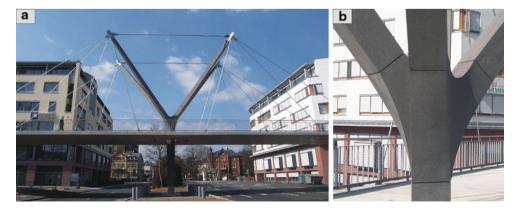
Footbridge in Bad Homburg (Germany) made of Nero Assoluto from Zimbabwe (Source SBP GmbH). a General view of the footbridge; b detail of support mast
